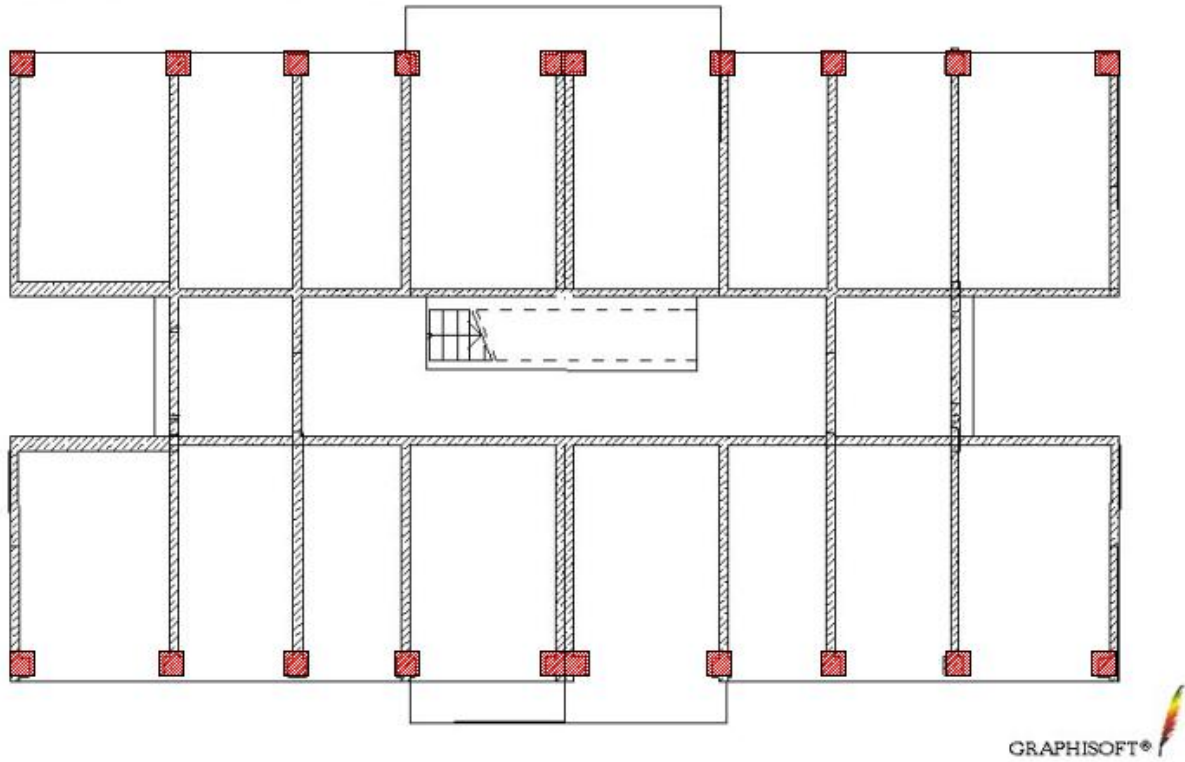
Floor plan showing the wall panels and the stiffening boundary elements
